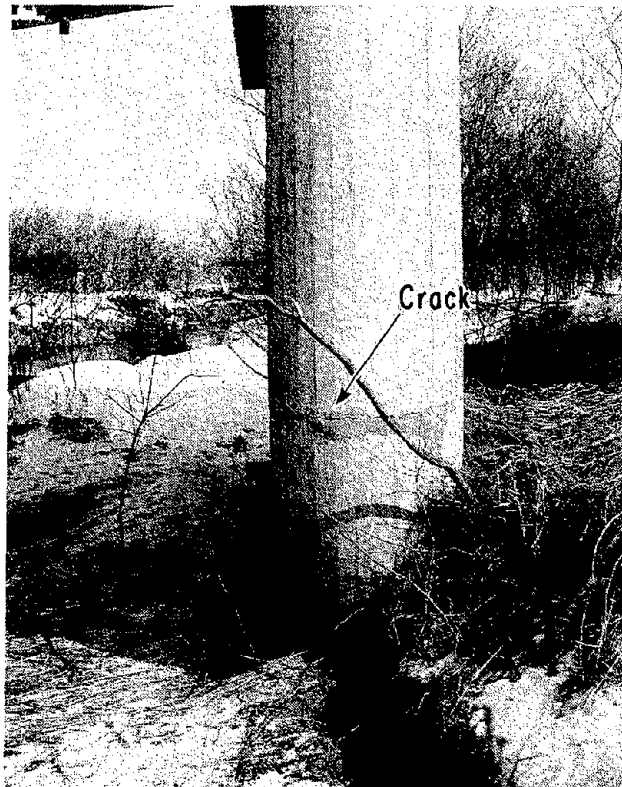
Cracks of Shin-Tawa Bridge (Pier P1)
